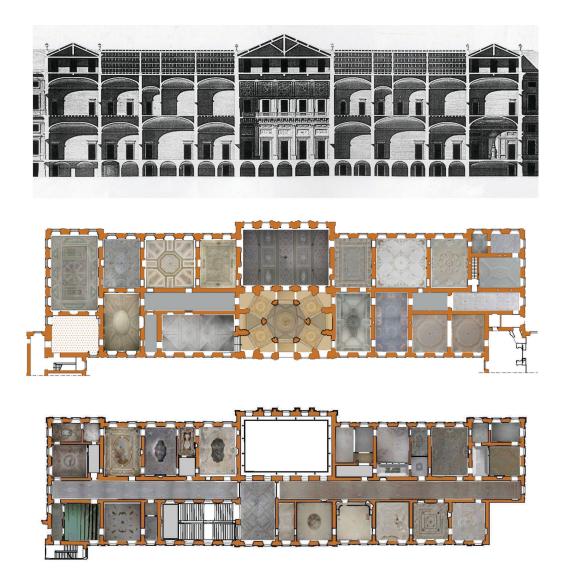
Above, original longitudinal section (south-north) and the central part of the building, drawn by architect Giuseppe Piermarini in 1780. Centre and below, the surveyed plans of the building (first and second floor) with the orthophotos of the vaults of the rooms.
